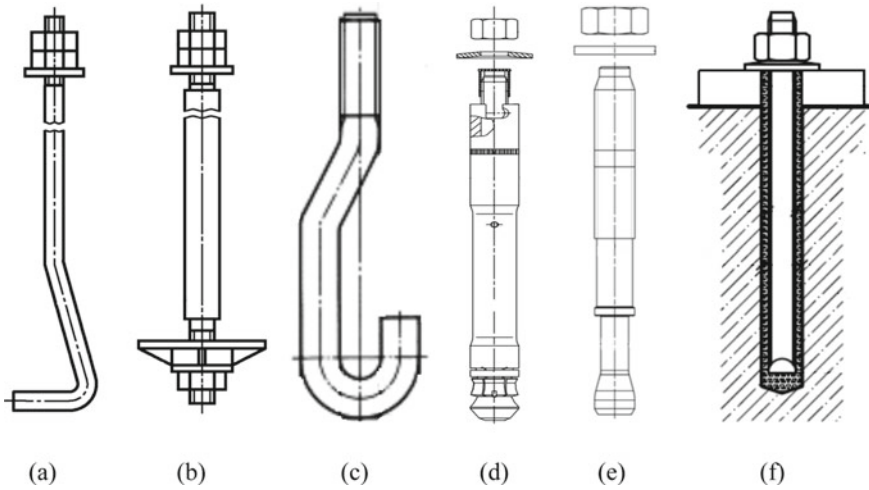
Types of tested anchors: a bent anchors; b anchors with an anchor plate; c anchors with a bar hook; d undercut anchors; e wedge expansion anchors; f bonded anchors
